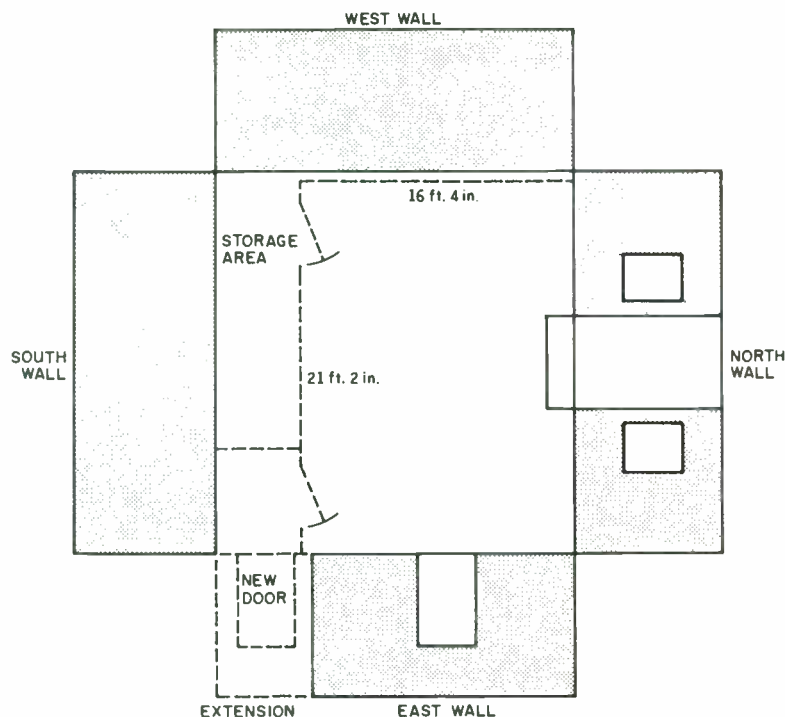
Construction plans for my selected room, including a wall in front of the west wall and a storage area in front of the south wall. Finished room, 21'2" by 16'4" by 8'9".
